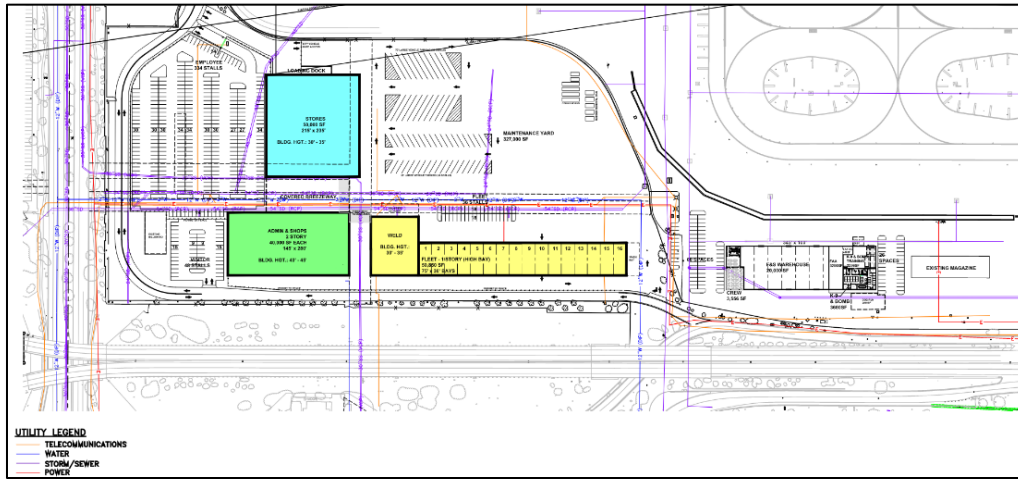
shows Scheme 2 for the F&S Tonto Campus. Scheme 2 shows the Admin and Shops building located just outside the arrival Runway Protection Zone (RPZ). The proposed Admin and Shops building’s parking area is located west of the building and accessed via the north side of the site off the realigned Tonto Street. The proposed Stores building is located south of the Admin and Shops building and is connected to the Admin and Shops building by a covered breezeway. The proposed parking area for the Stores building is located west of the building and is accessed at the same location as the parking for the Admin and Shops building. The Stores building has a proposed loading dock on the east side of the building which is accessed via the south side of the site off the realigned Tonto Street. The proposed Fleet building is located east of the Stores building. The parking area for the Fleet building is located between the Fleet building and the proposed Maintenance Yard to the north and is accessed via the south side of the site off the realigned Tonto Street.
